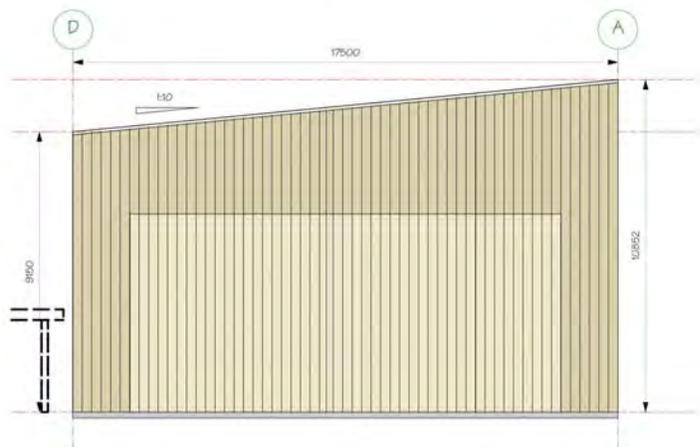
North Elevation (facing Sutcliffe Road) (from plans by Praxis Architects Inc.)
